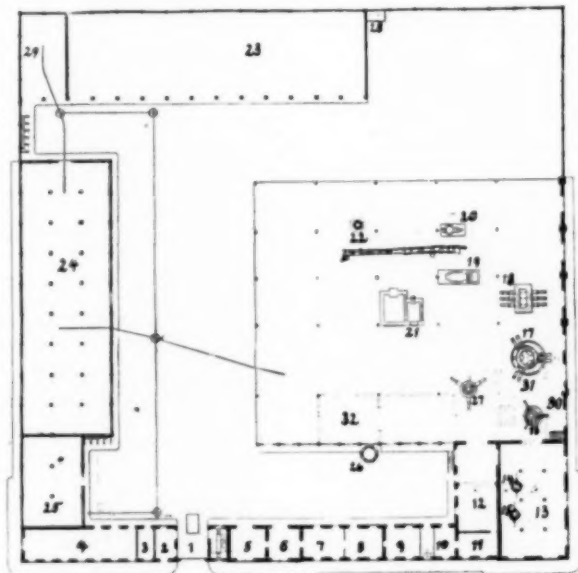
PLAN OF STASSANO STEEL WORKS, TURIN.
